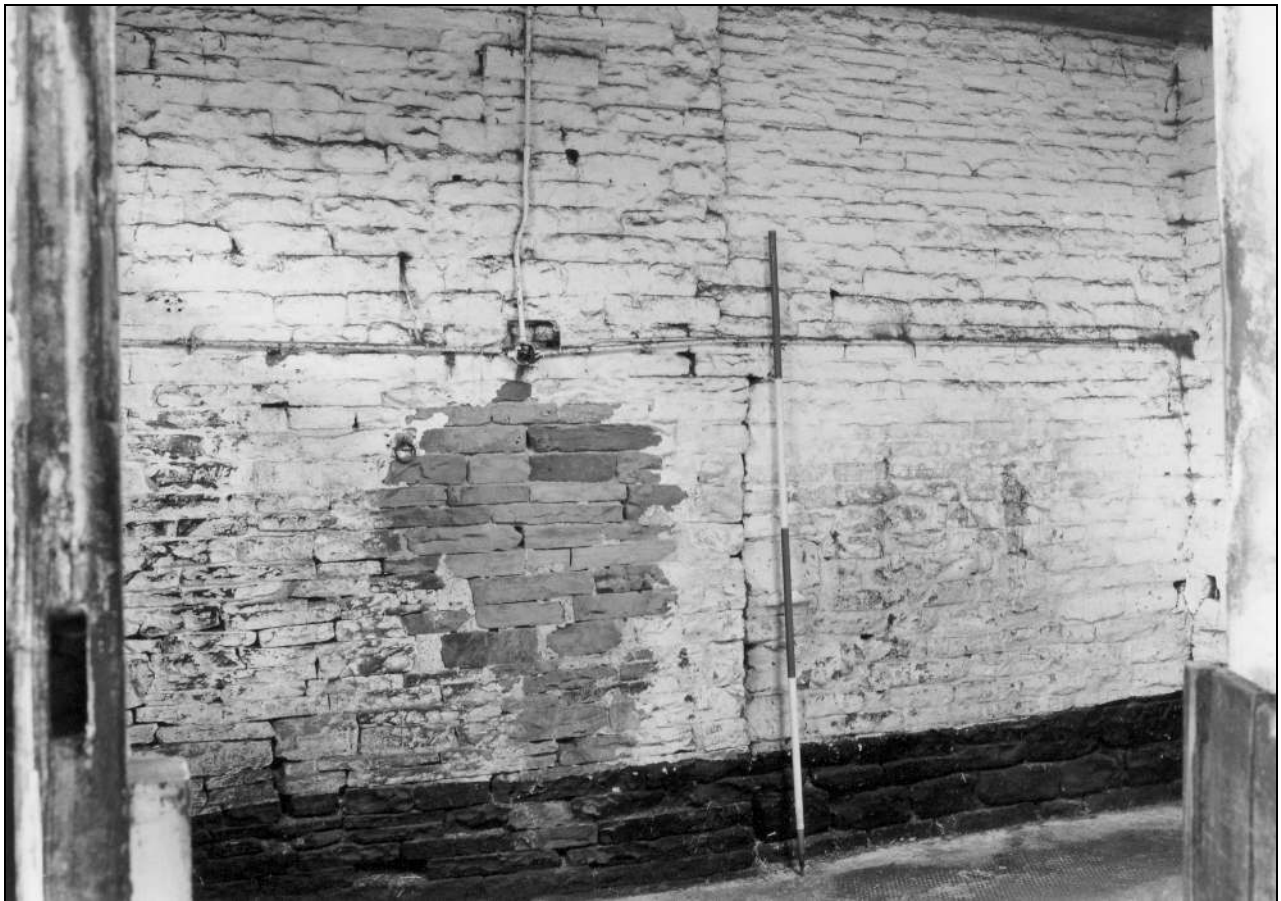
East wall of barn within later lean-to, showing where north end extended, from the east (film 2, frame 13)
